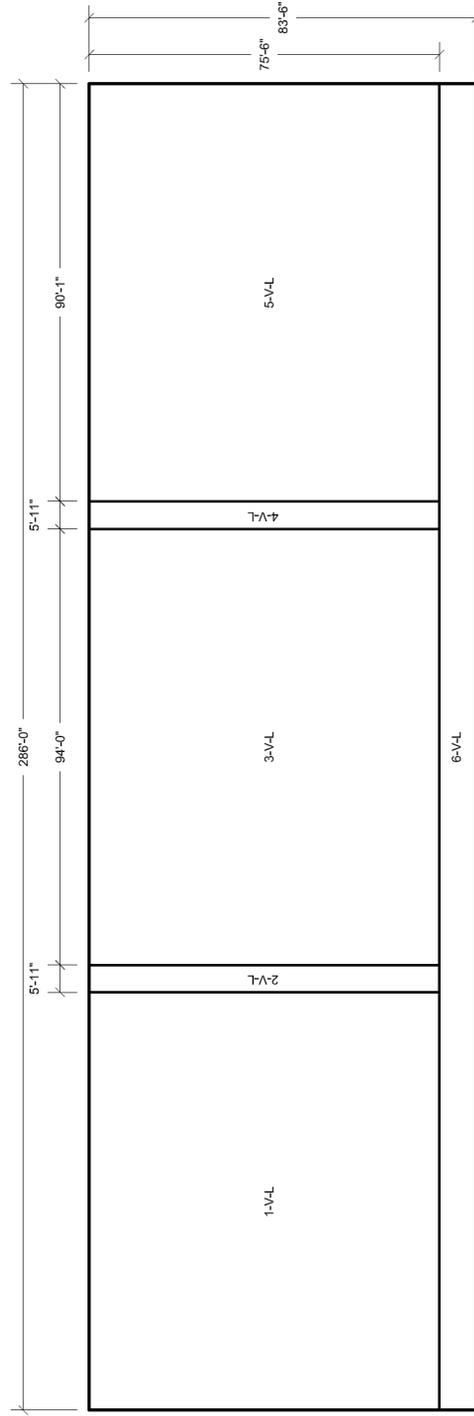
H.6-80: UHS BASIN SOUTH WALL LOOKING NORTH
